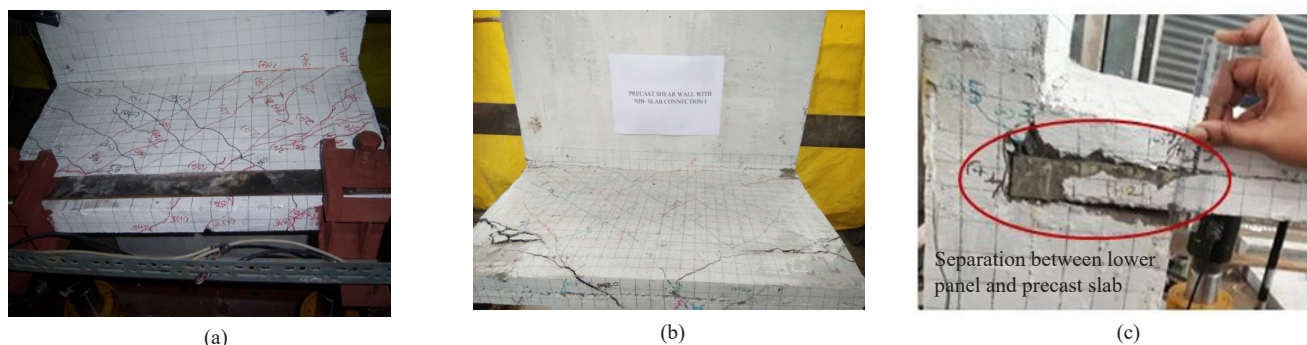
Crack pattern: (a) monolithic specimen, (b) precast specimen, (c) separation of precast structural members
